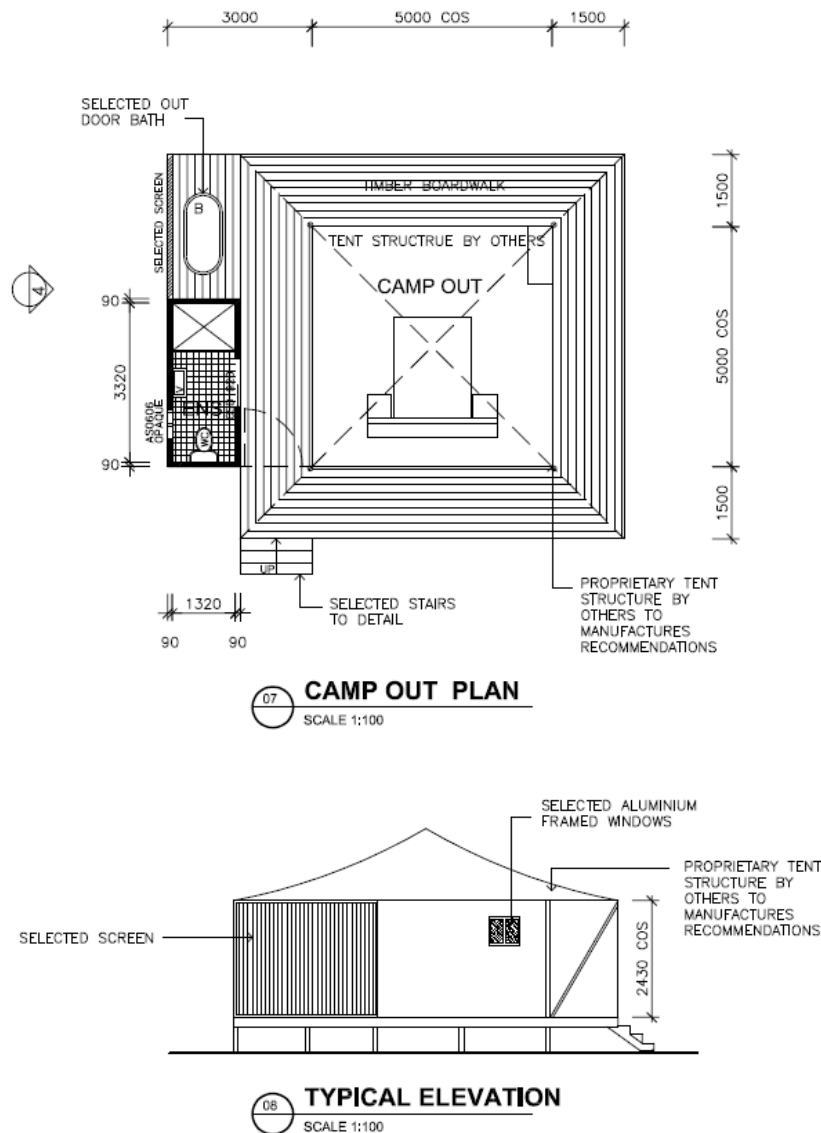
Extract of the Floor & Elevation Plan for the Tent Site and Amenities Structure
